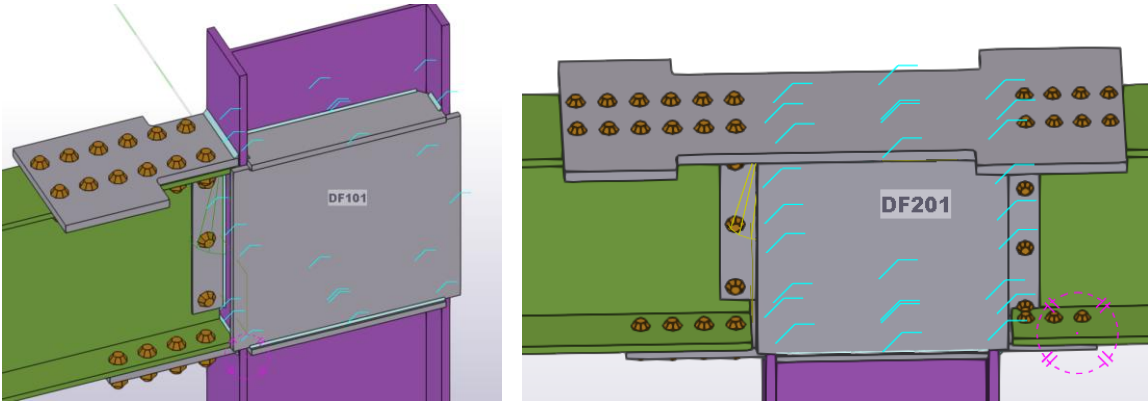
R3 Narrow Extended Top Plates (lower and roof conditions)
